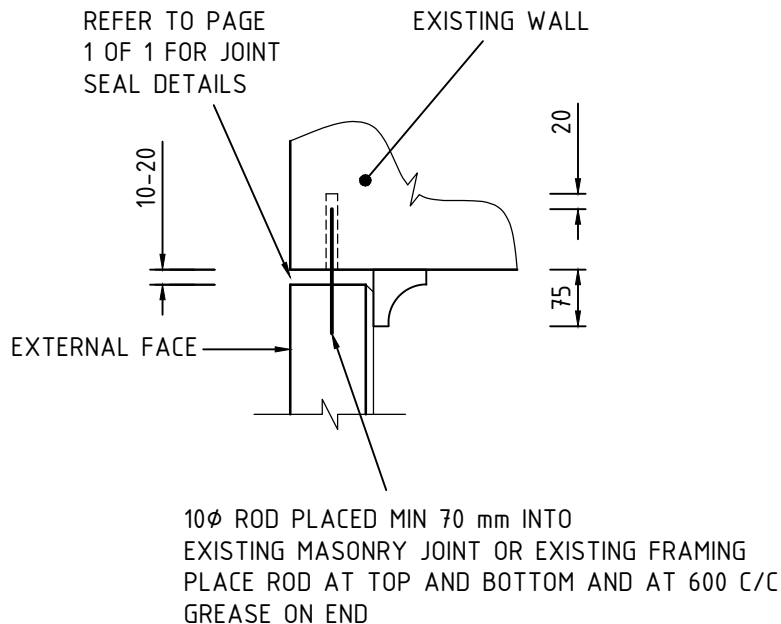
LIGHT FRAMED WALL CONSTRUCTION
